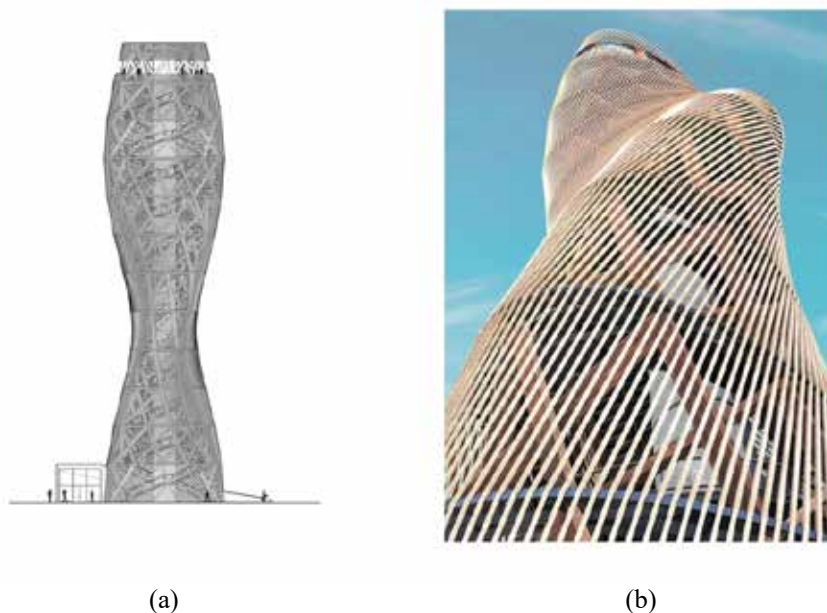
Twist Light Tower showing diagrid clad in wood lattice: (a) elevation drawing, (b) exterior view from below
